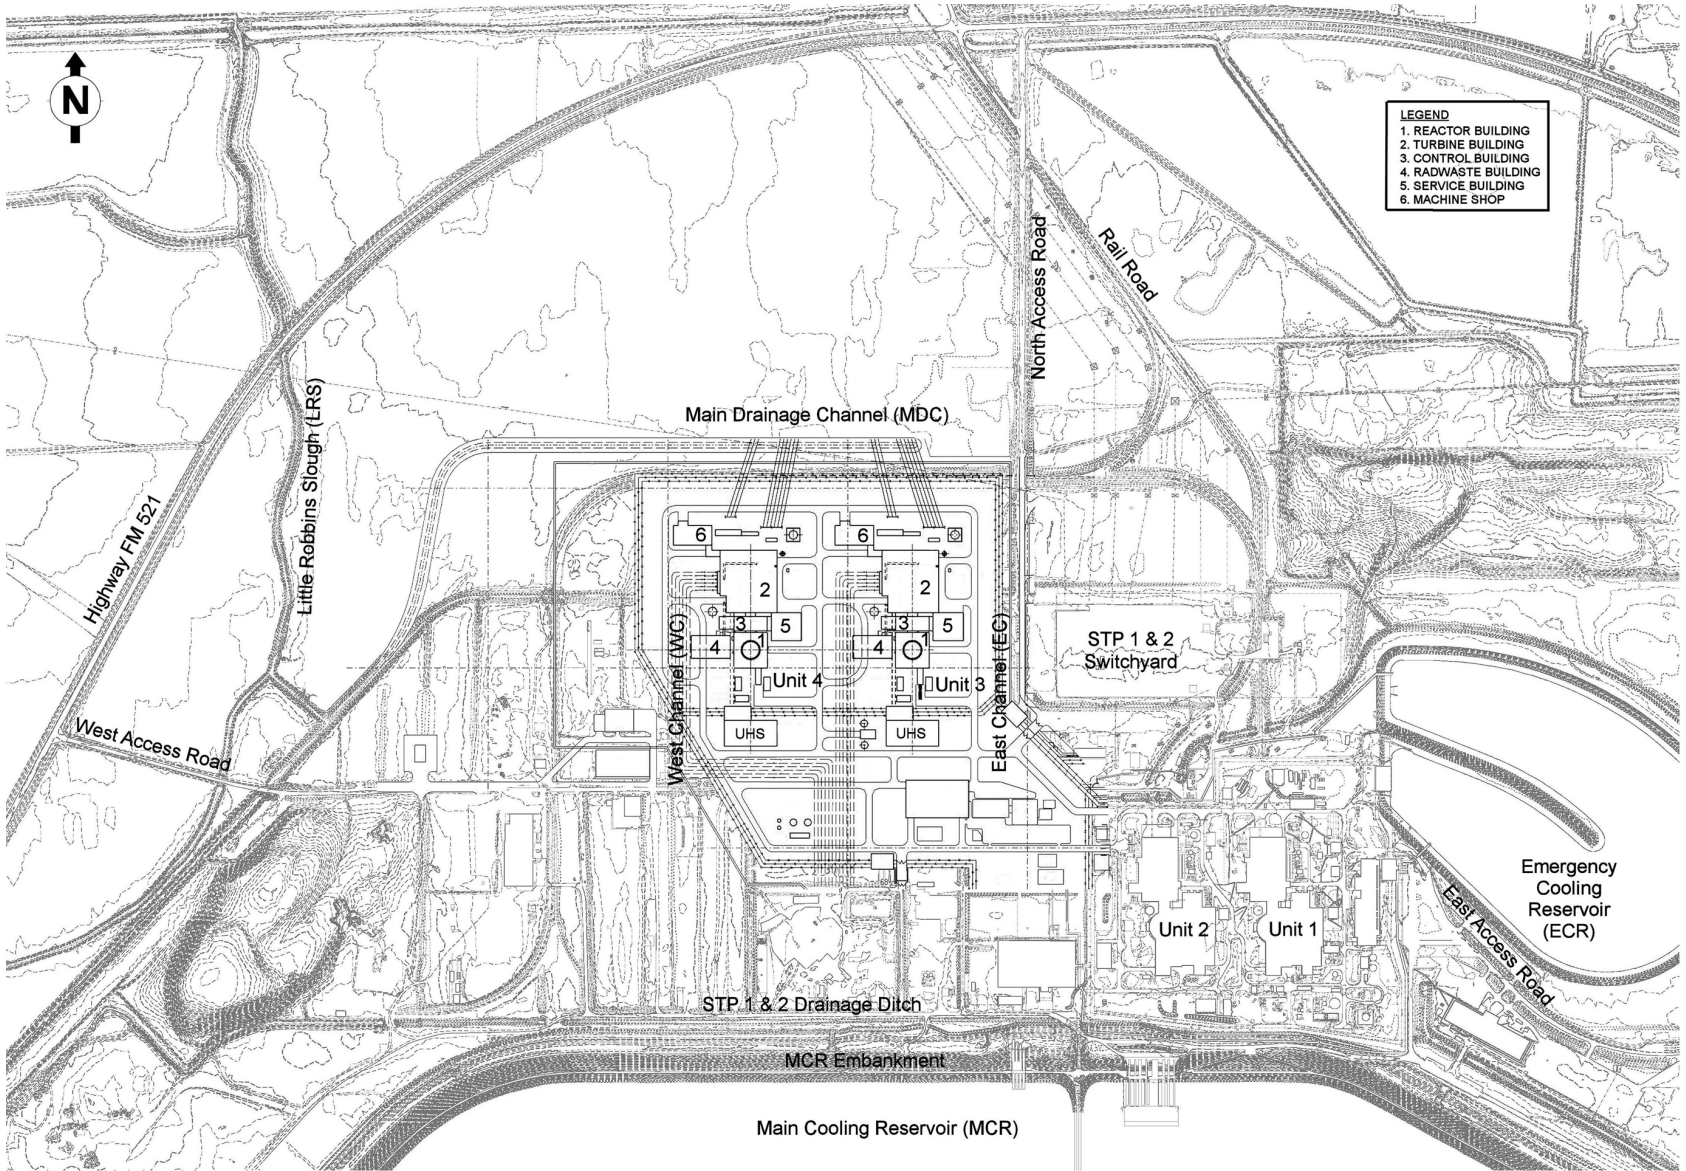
S.2-4 Site Layout and Major Drainage Routes
